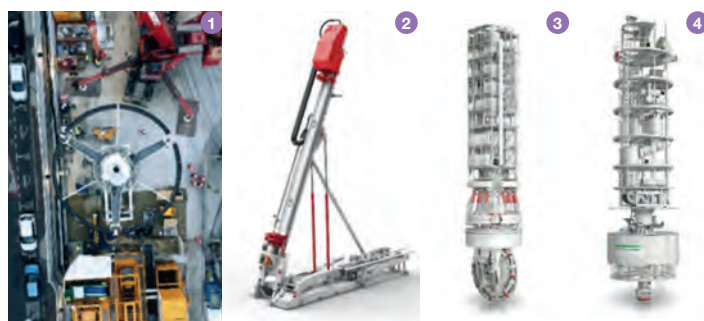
Overview of the different vertical & shaft boring Machines: 1 Vertical Shaft Machine (VSM), 2 Slant Directional Drilling (SDD), 3 Shaft Boring Machine (SBM) and 4 Shaft Boring Roadheader (SBR).
